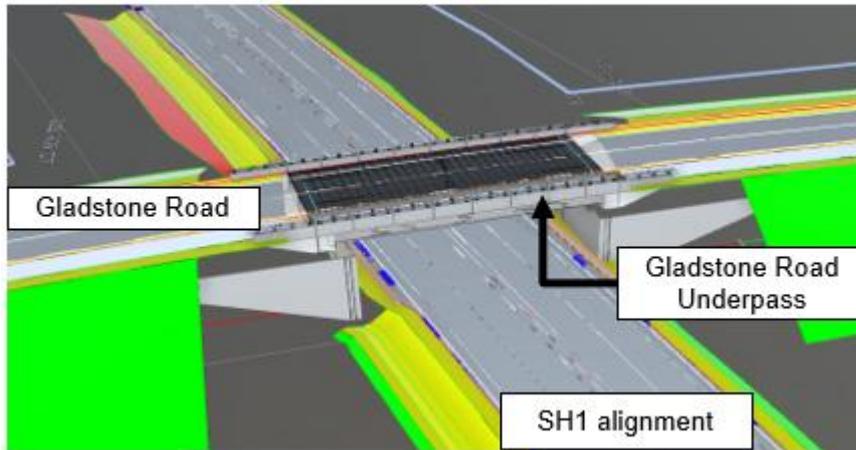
3D Illustration of Gladstone Road Underpass
